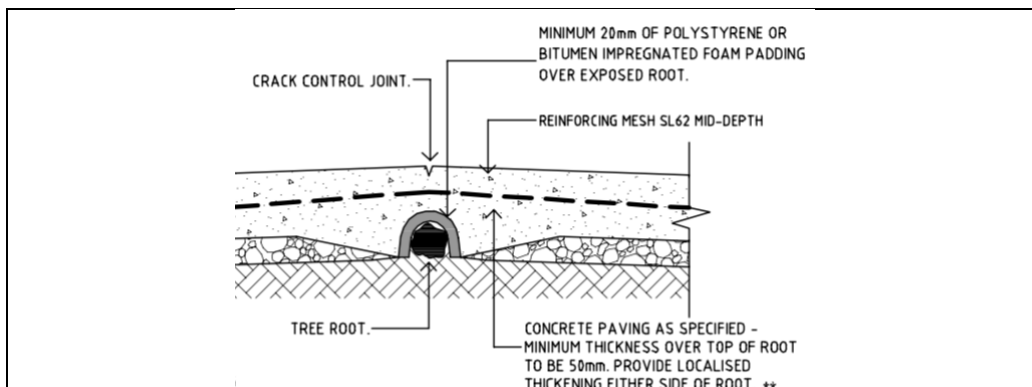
Image D: Example method for bridging concrete surfacing over tree roots provided in the Canterbury Bankstown Council standard drawings.⁵
